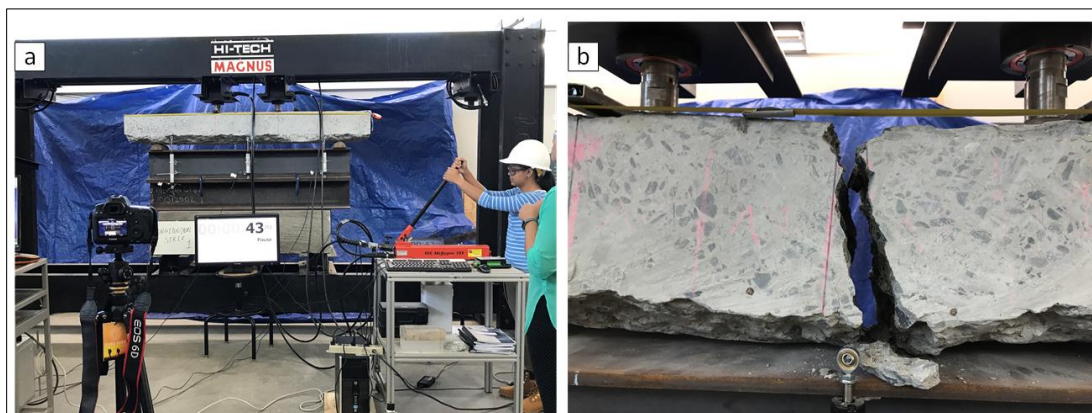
Samples were extracted from concrete bus pads in Baltimore and tested for cracking.
